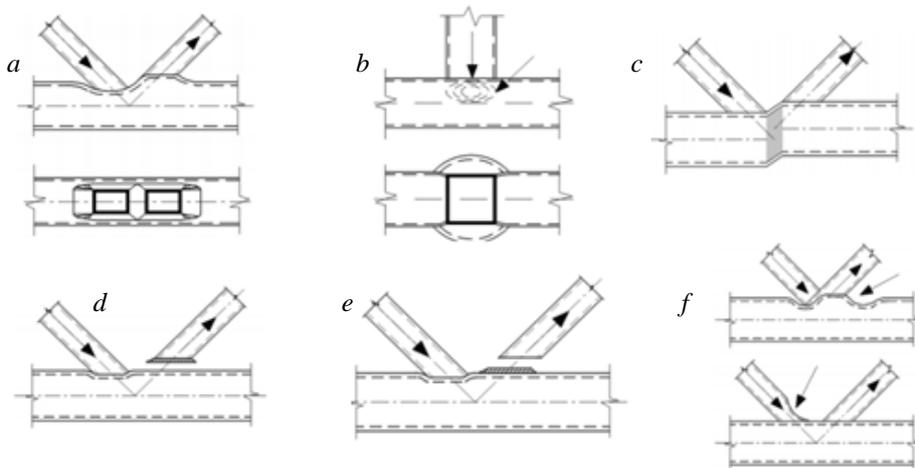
Failure modes in K-Connections according to EN 1993-1-8: *a* – chord face failure; *b* – chord side wall failure; *c* – Chord shear failure; *d* – Punching shear; *e* – brace failure; *f* – local buckling.
